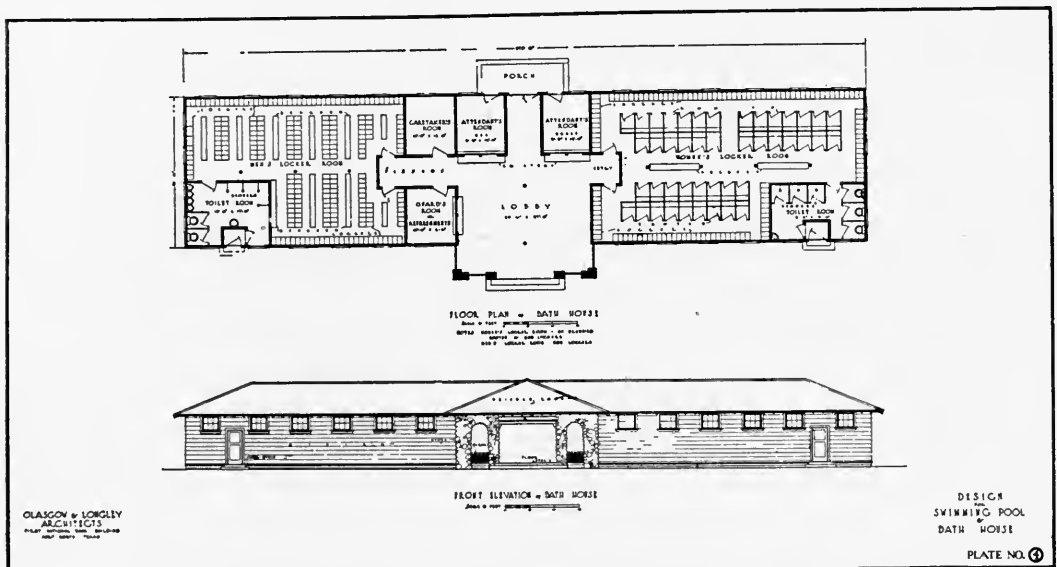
FLOOR PLAN AND FRONT ELEVATION
